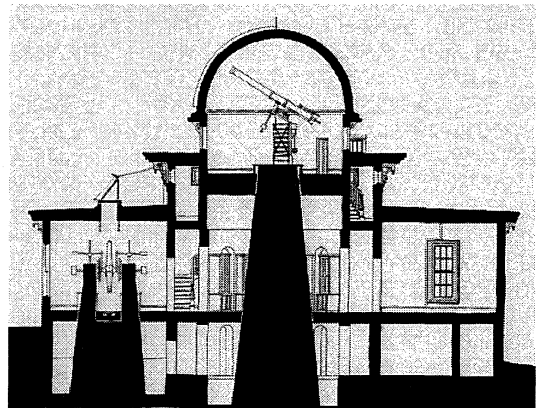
This cross section drawing of Detroit Observatory shows the instrument piers. Note that for graphical clarity, the refracting telescope is shown in an east/west (rather than the proper north/south) position (Courtesy: Detroit Observatory Collection).
